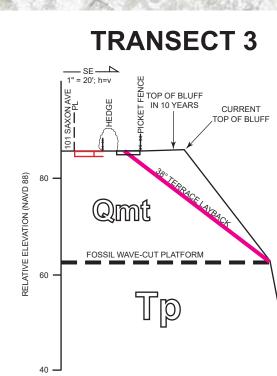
Site Plan Showing Zone of Short Term Blufftop Retreat
